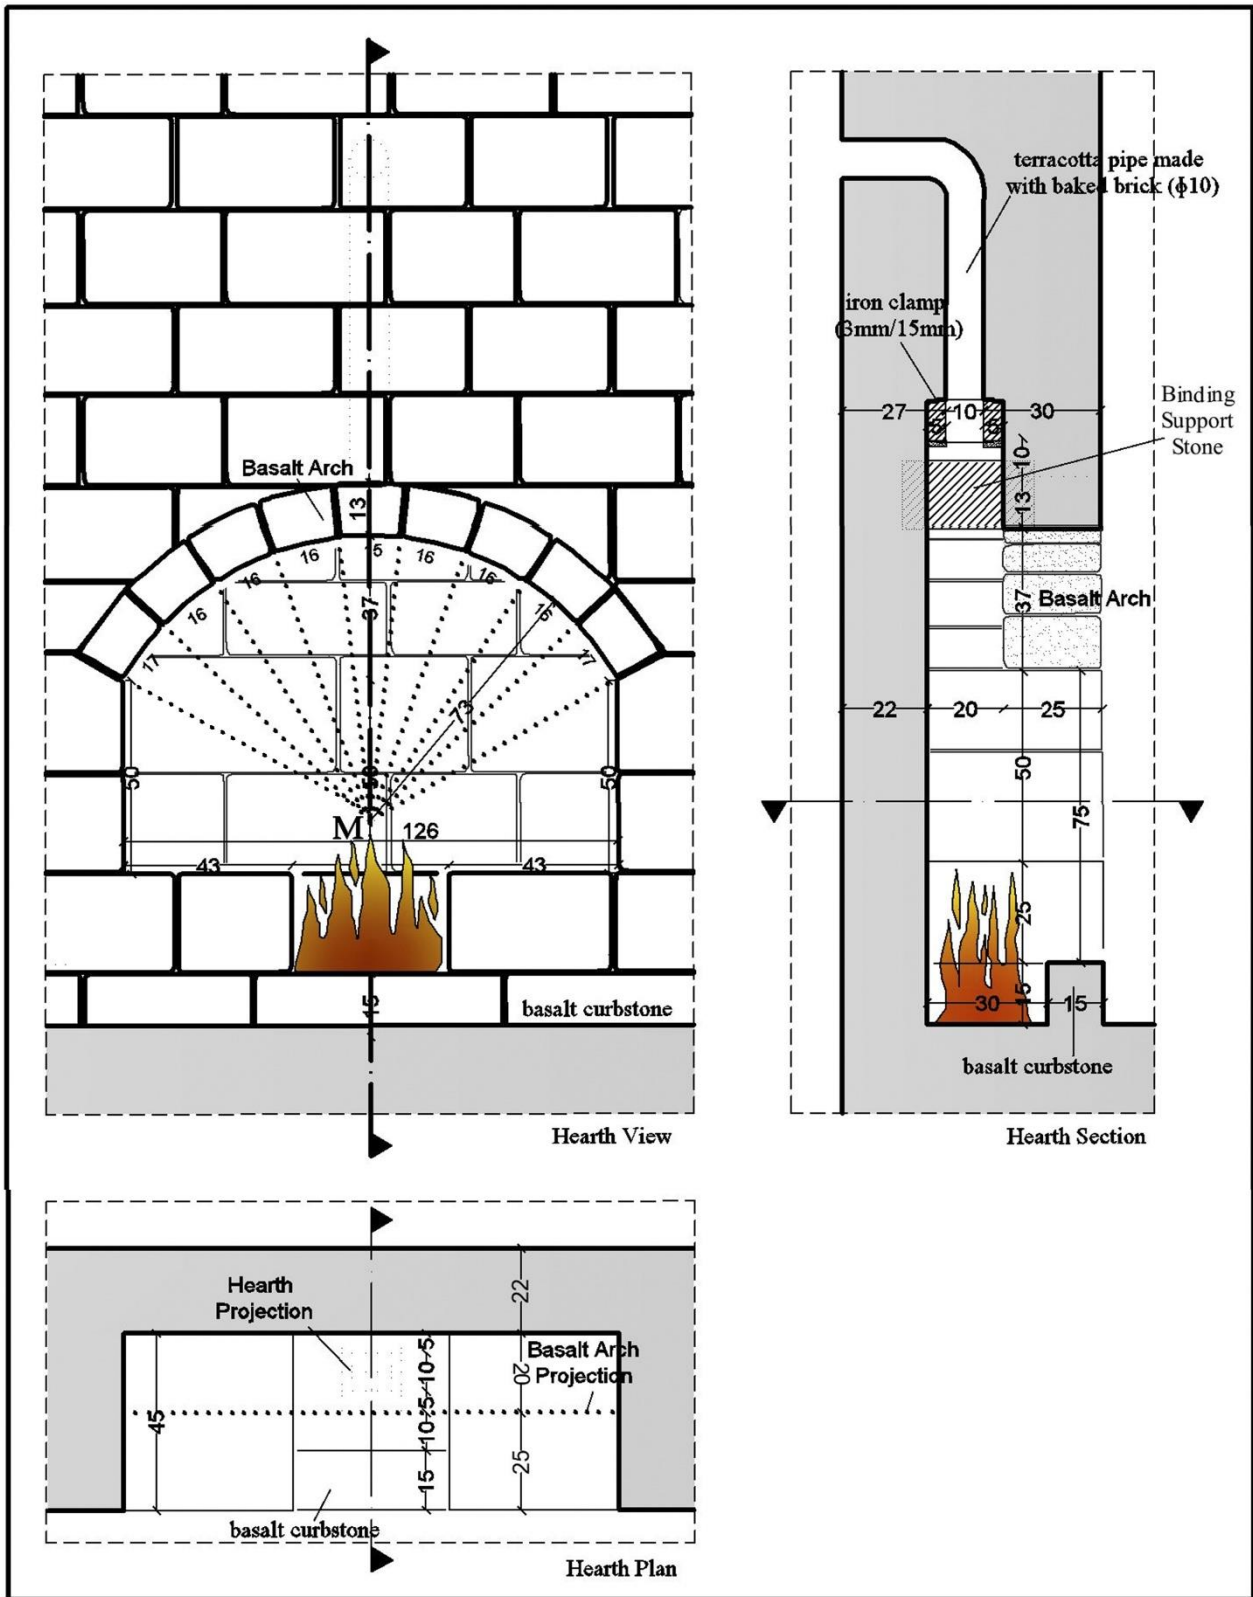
Detail of the evacuation of the smoke from the street wall by pipes
